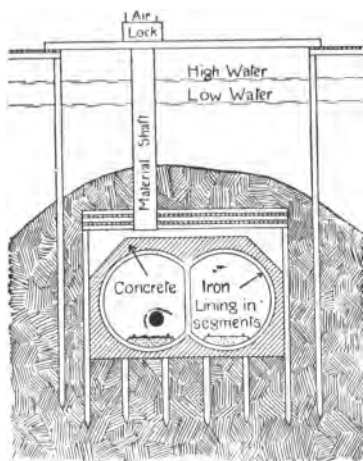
Harlem River Tunnel. Section completed inside caisson.
